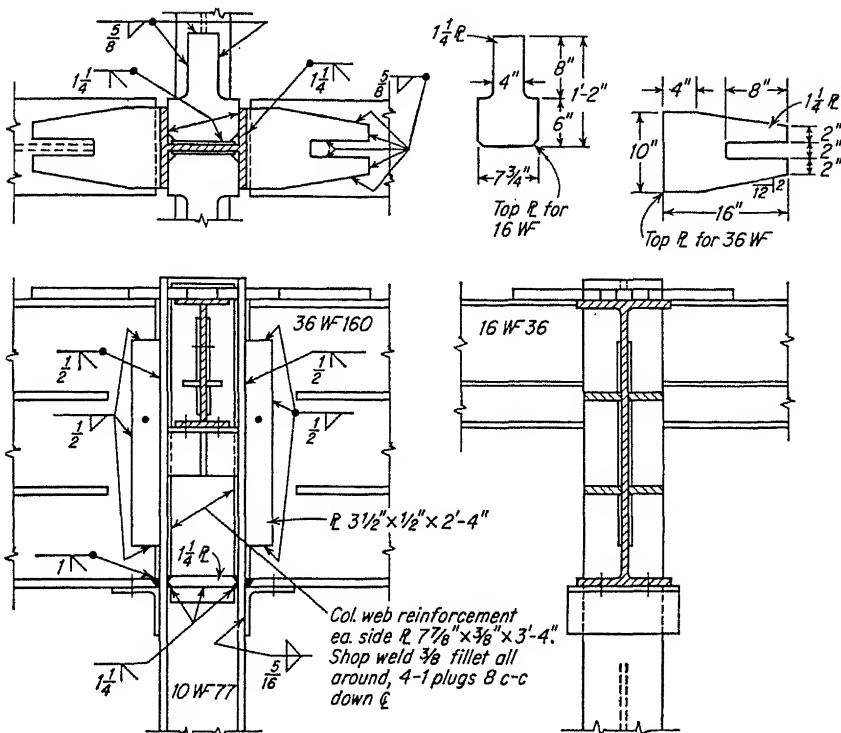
Girder-to-column connection [Chap. 1, Ref. 8].
